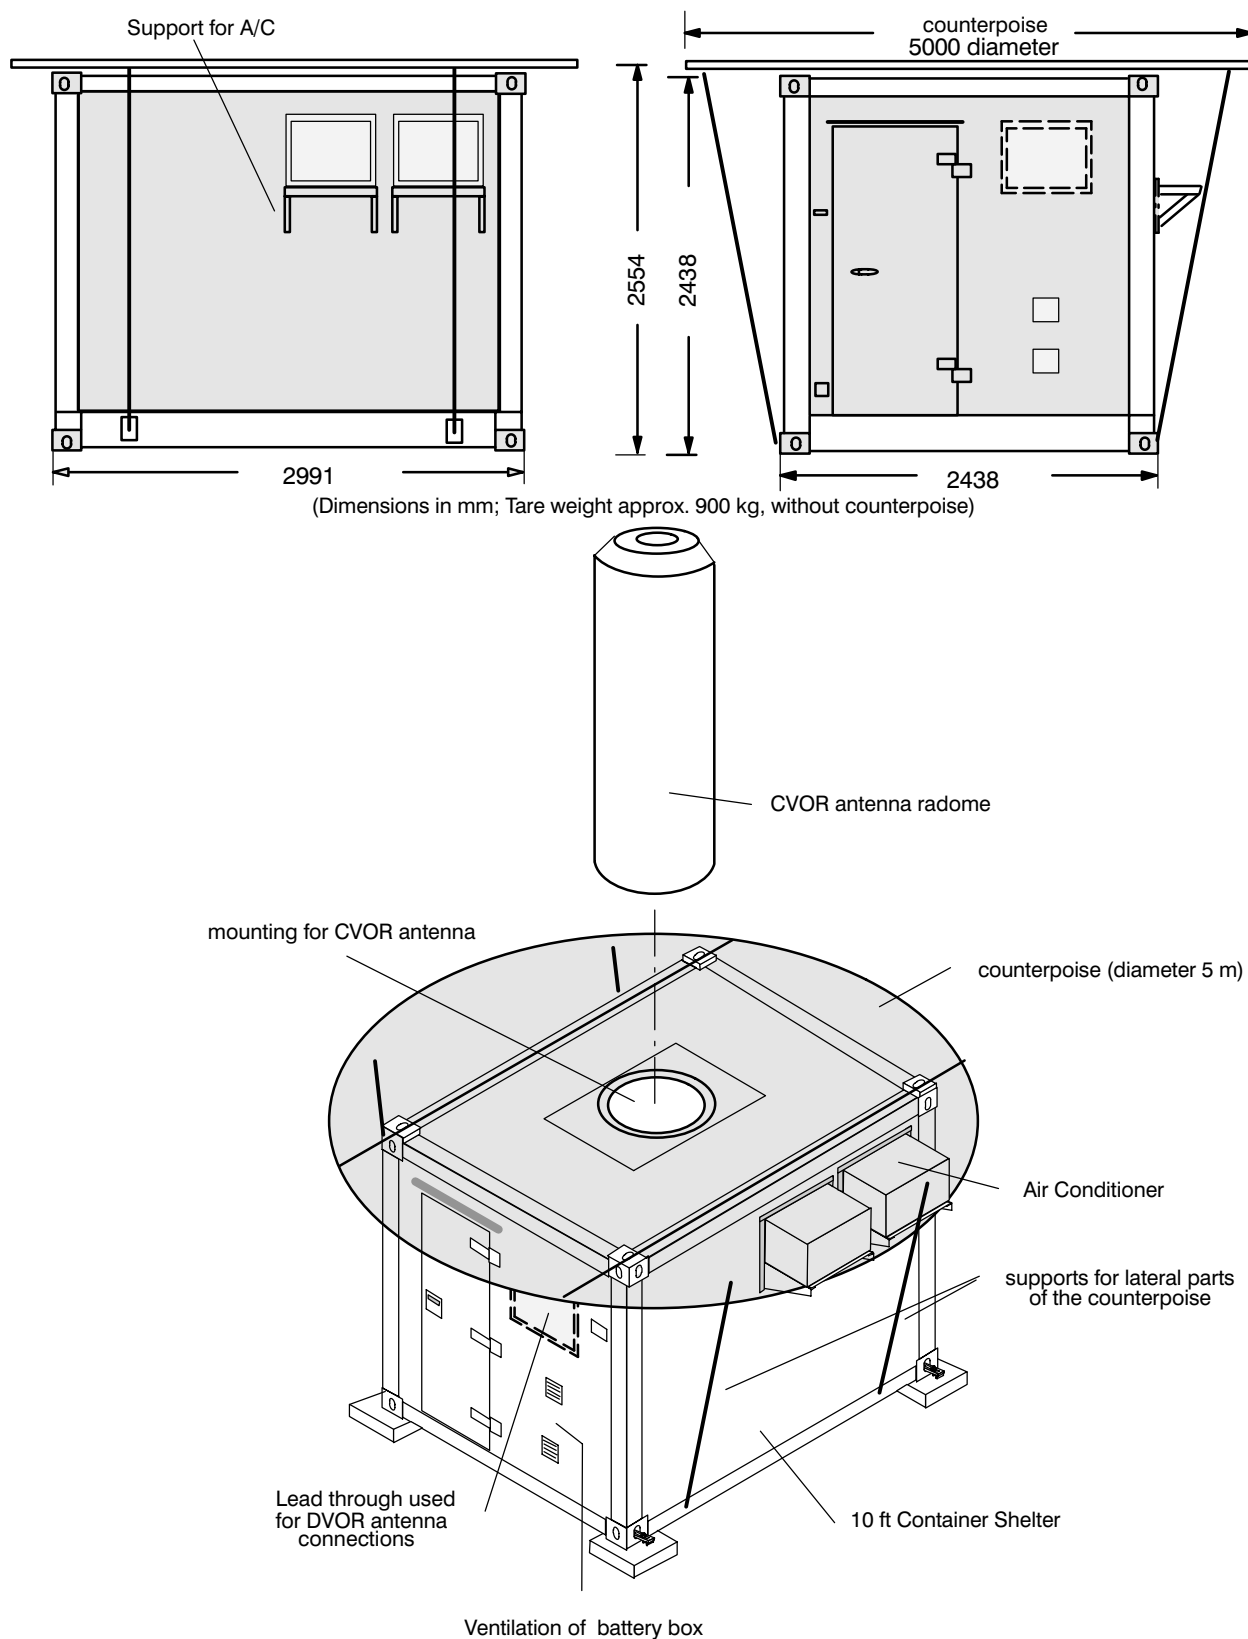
4 10 ft CVOR container shelter, dimension and general view
